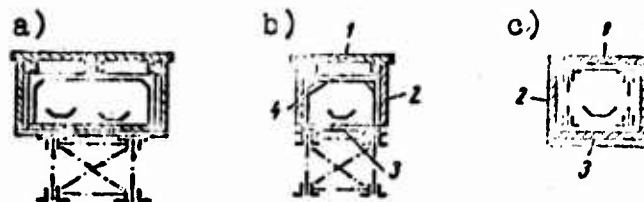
Diagrams of conveyor galleries: a) wide gallery with the arrangement of conveyors towards the top of the trusses; b) narrow gallery with the arrangement of the conveyor towards the top of the trusses; c) narrow gallery with the arrangement of the conveyor towards the bottom of the trusses; 1, 2 and 3 - the guards for the capping, walls, flooring; 4 - frames of the hip of the gallery.
